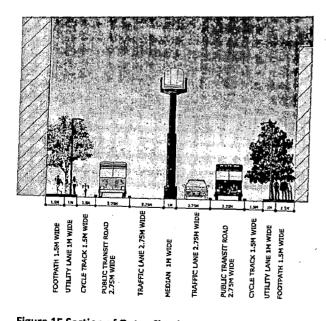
Section of Outer Circular Road 20 m wide (Source: by Author)
